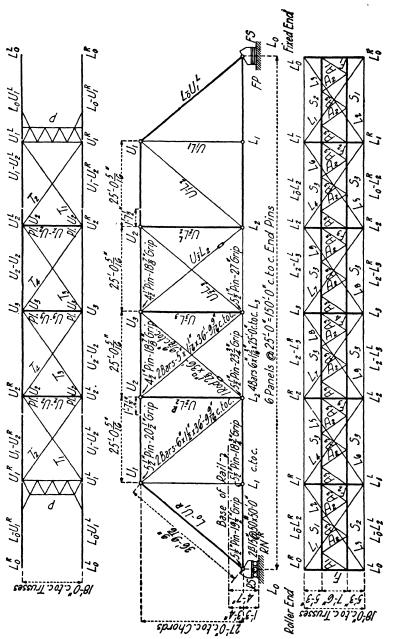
Standard Marking and Erection Diagram for a Truss Bridge.
